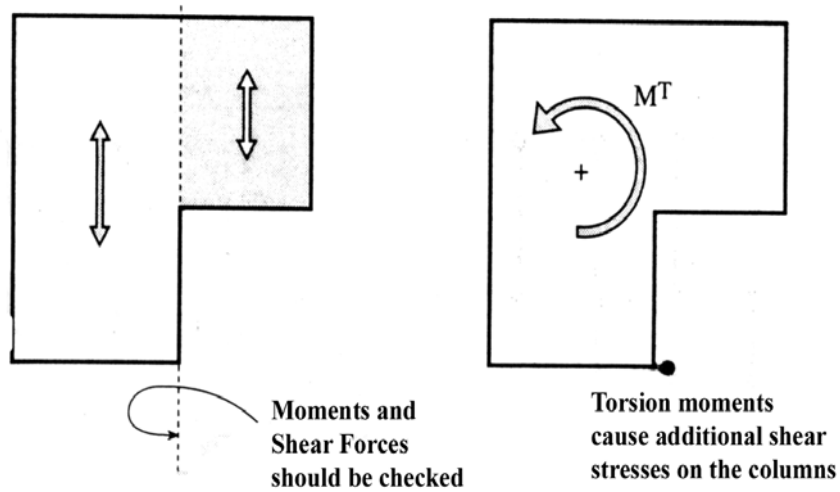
Disadvantages of Projections in Plan¹²⁷
